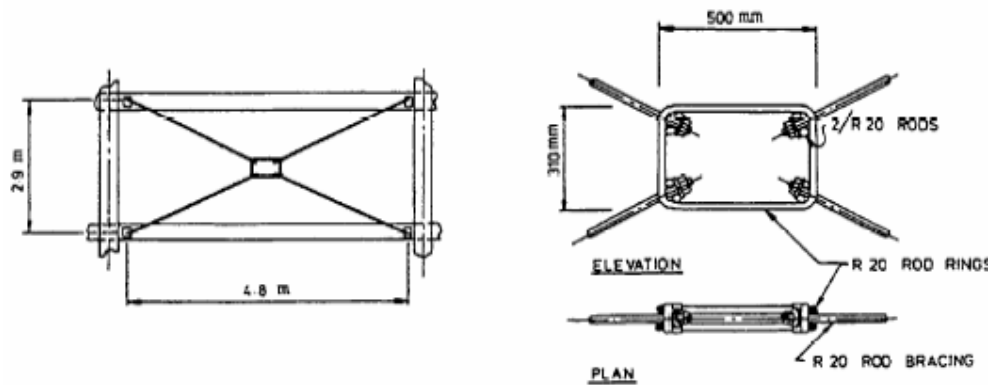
Yielding steel bracing system (Tyler, 1985)
